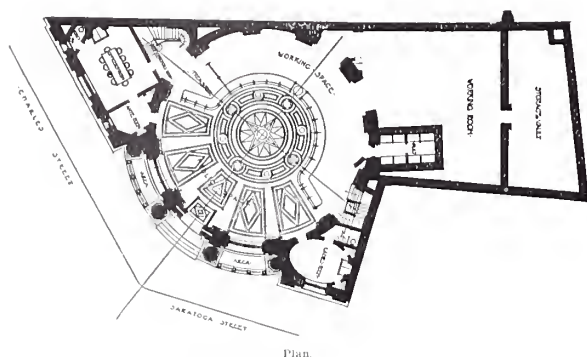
PLAN, METROPOLITAN SAVINGS BANK,
